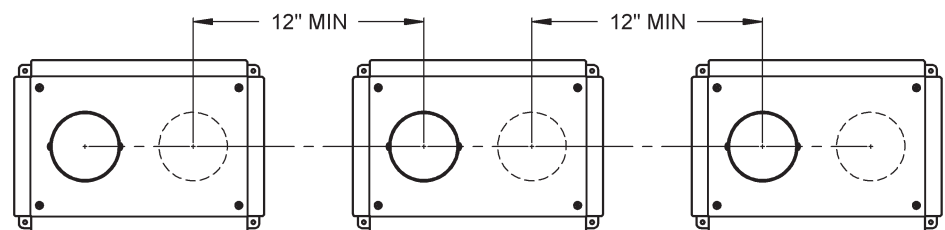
Minimum separations for multiple vent installation, horizontal orientation
